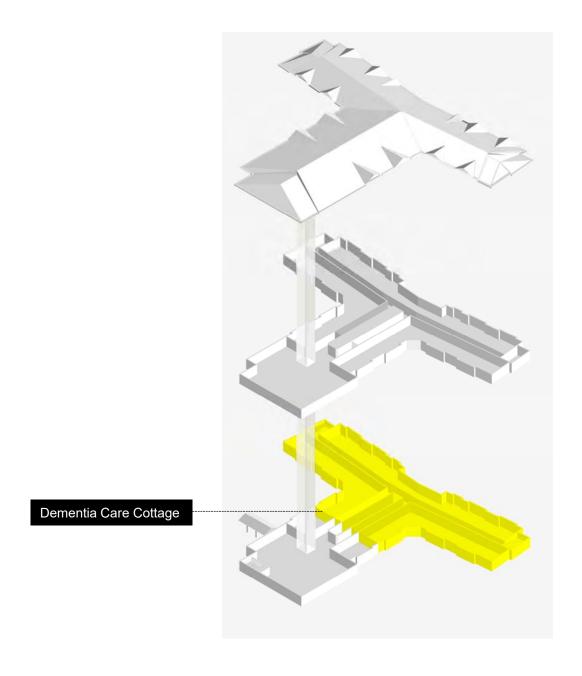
Spatial Configuration between Dementia Care Cottages and other Parts of Slave Lake Building
